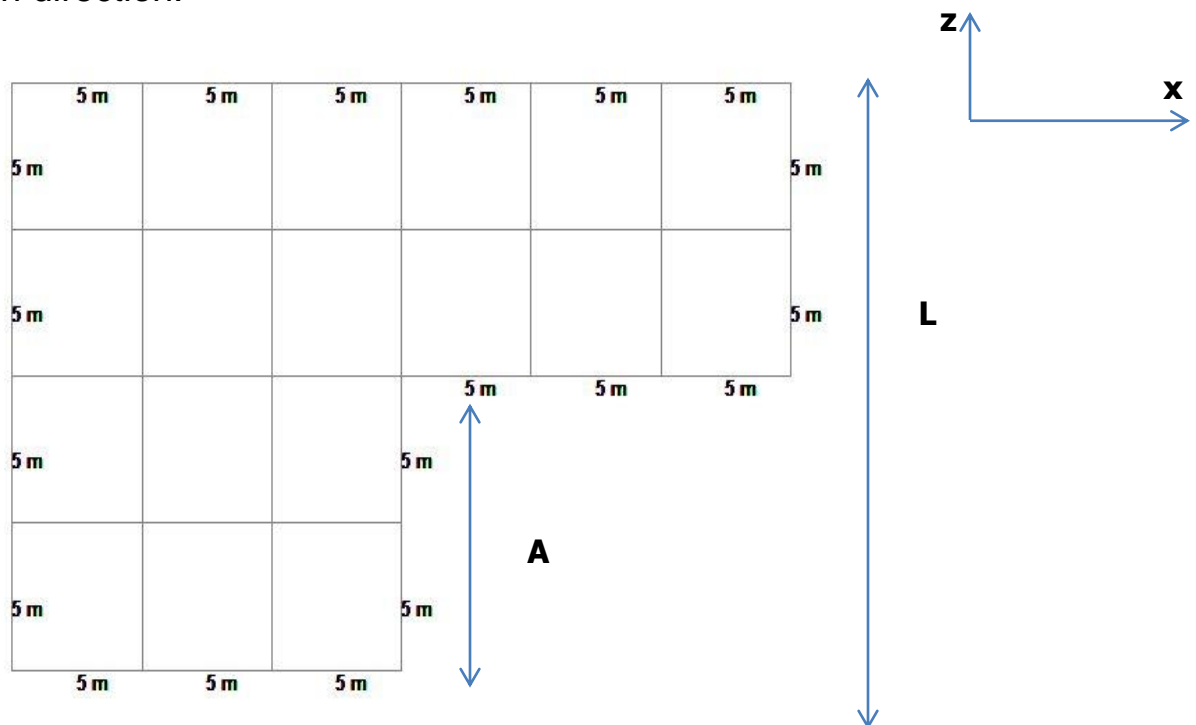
Plan of L shaped Re-entrant corner Structure(12 Storeys)
